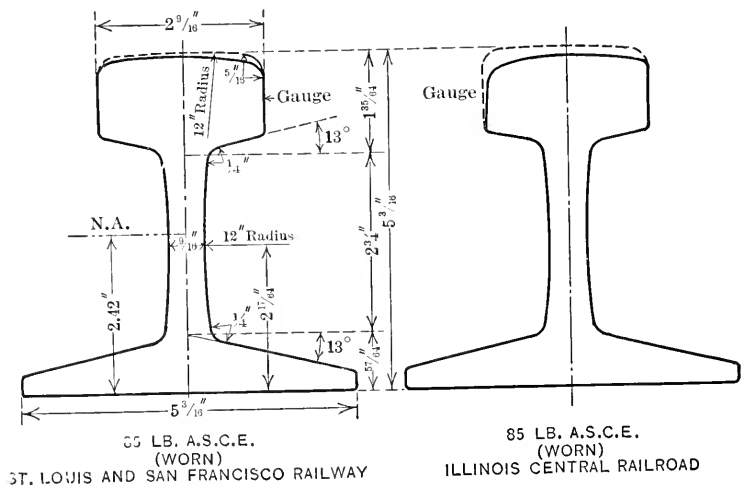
SECTIONS OF RAILS USED IN TESTS.
